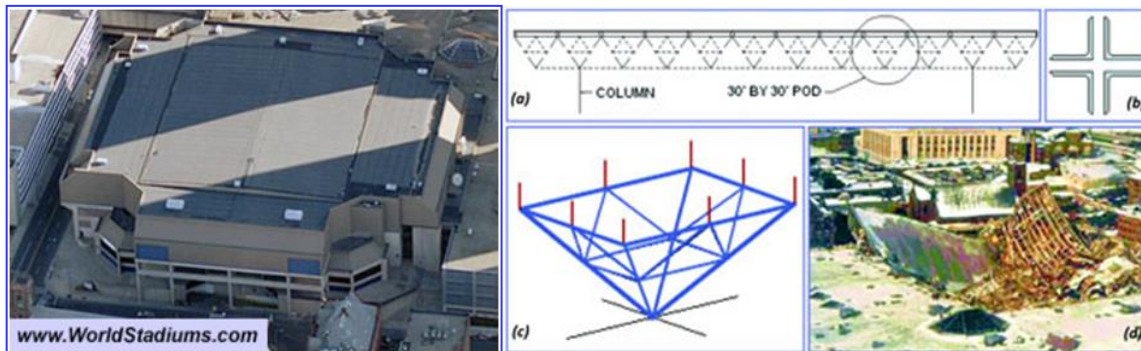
(Left) XL Center, (Right) (a) 3D Truss Section, (b) Member Cross-section, (c) Typical Pod, (d) Collapsed view.
